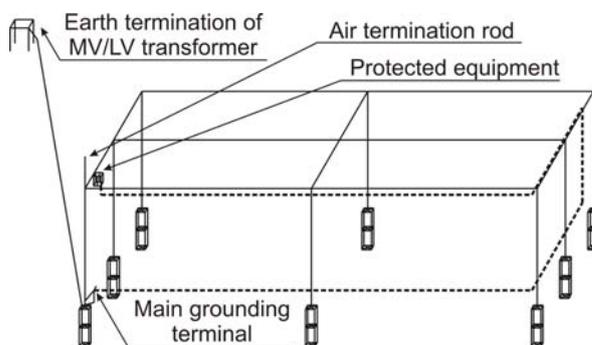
Locations of the protected equipment on the building roof and configurations of its PE wire path (dash line) inside the building
